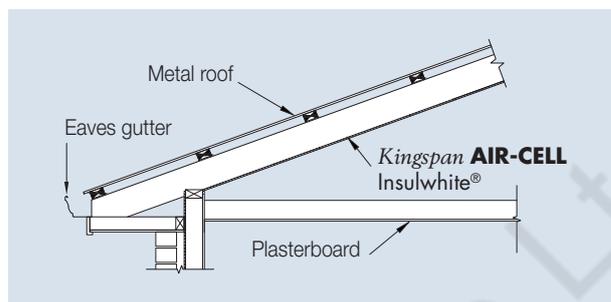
Side elevation of Kingspan AIR-CELL Insulwhite® in a pitched metal roof retrofit (attic conversion)
